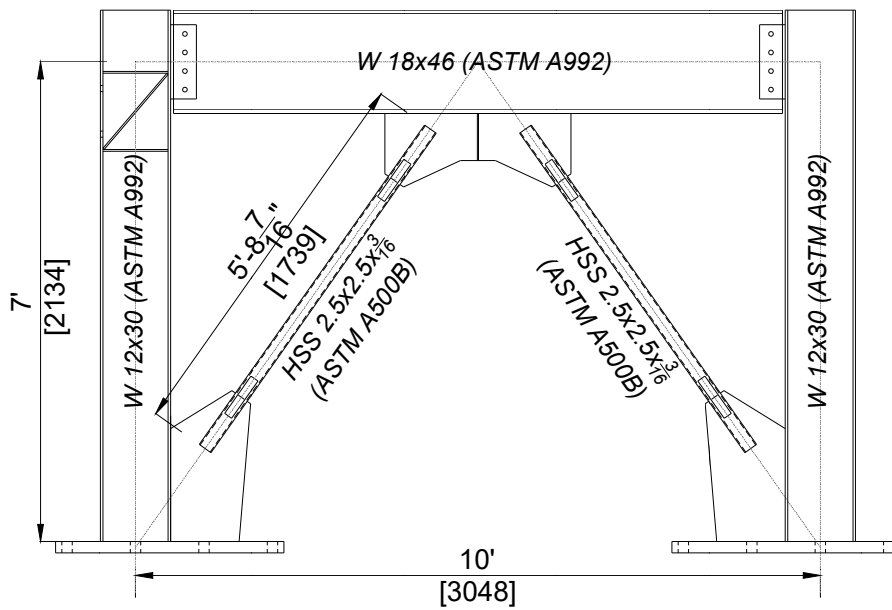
Details and designed sections for final test specimens [dimensions in both US units (in., ft) and metric (mm) are provided].
